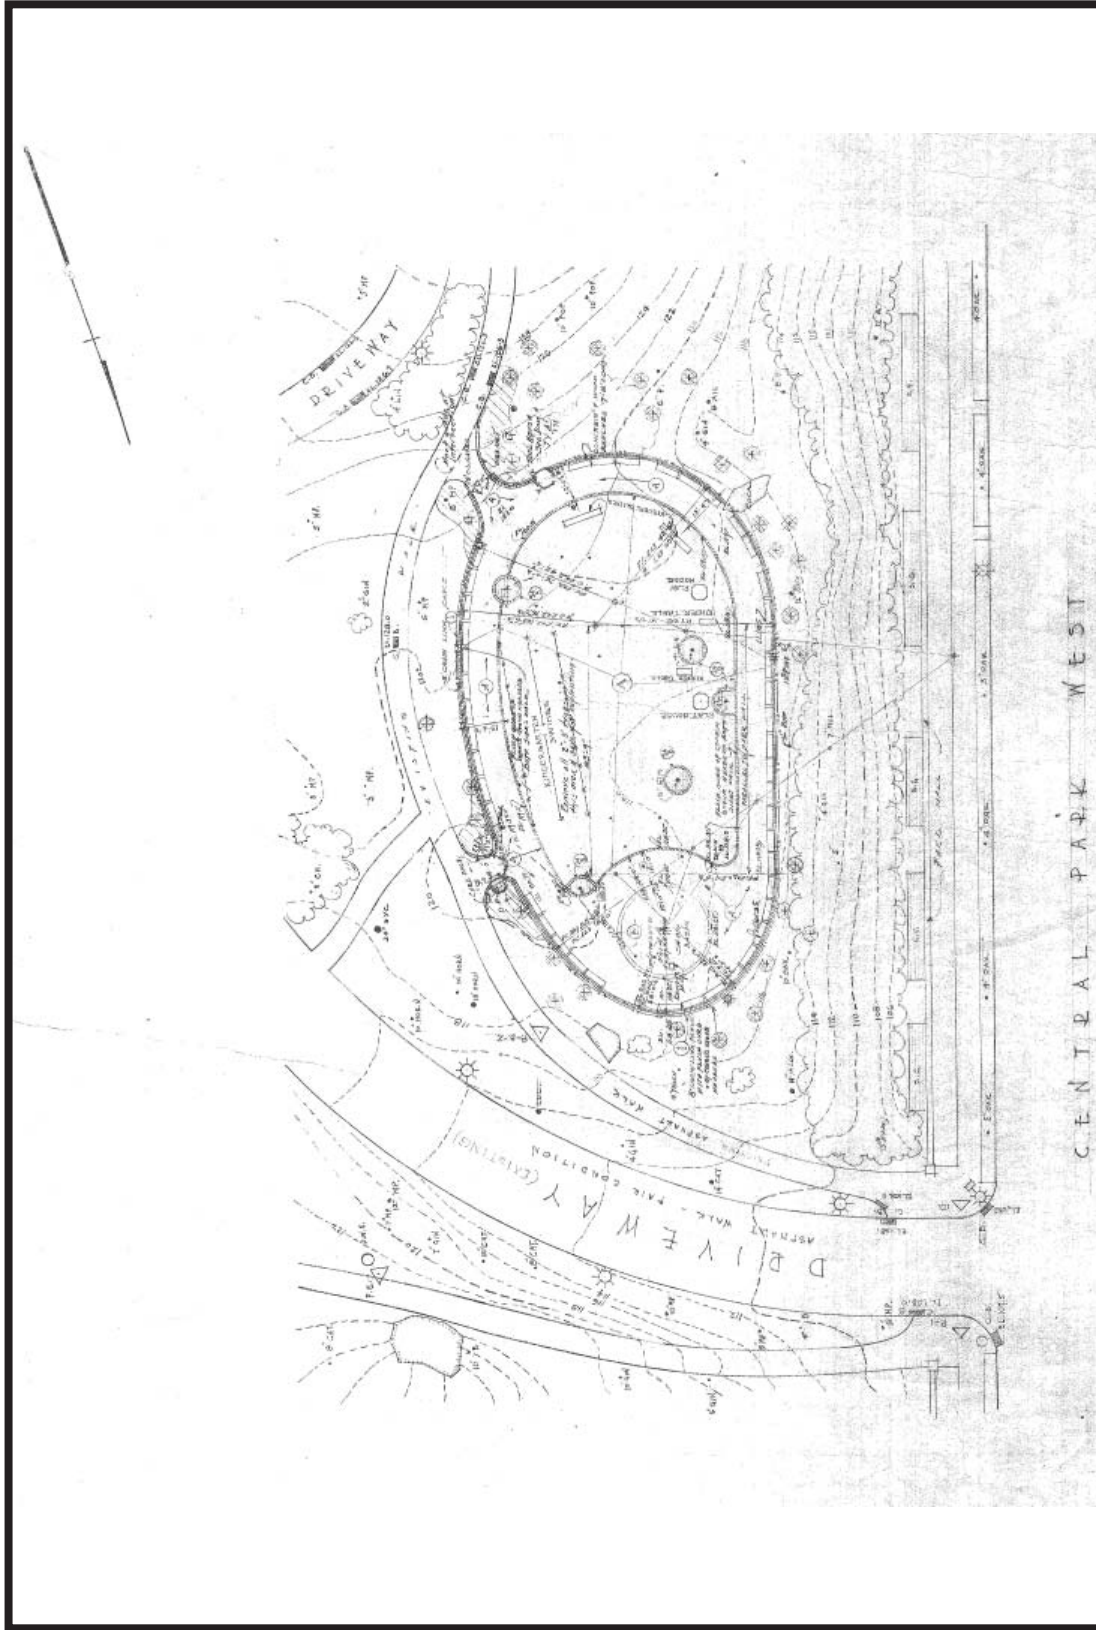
City of New York, Department of Parks. Landscape Plan for Marginal Playground No. 17 (Mariners' Playground). 1936. Scale 1 inch: 35 feet (approximately).
